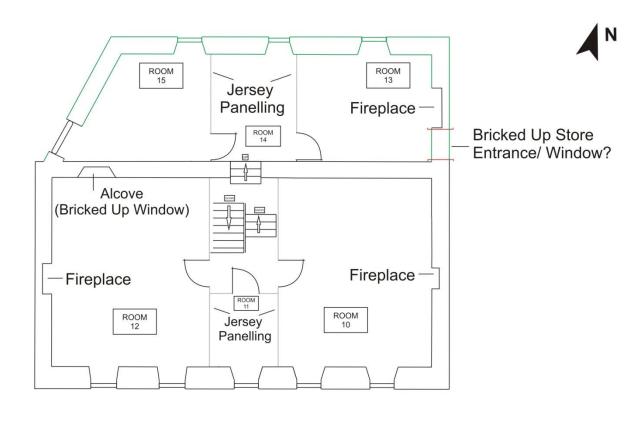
Overdale, Ground Floor Plan-Early Phase Scale 1:100
